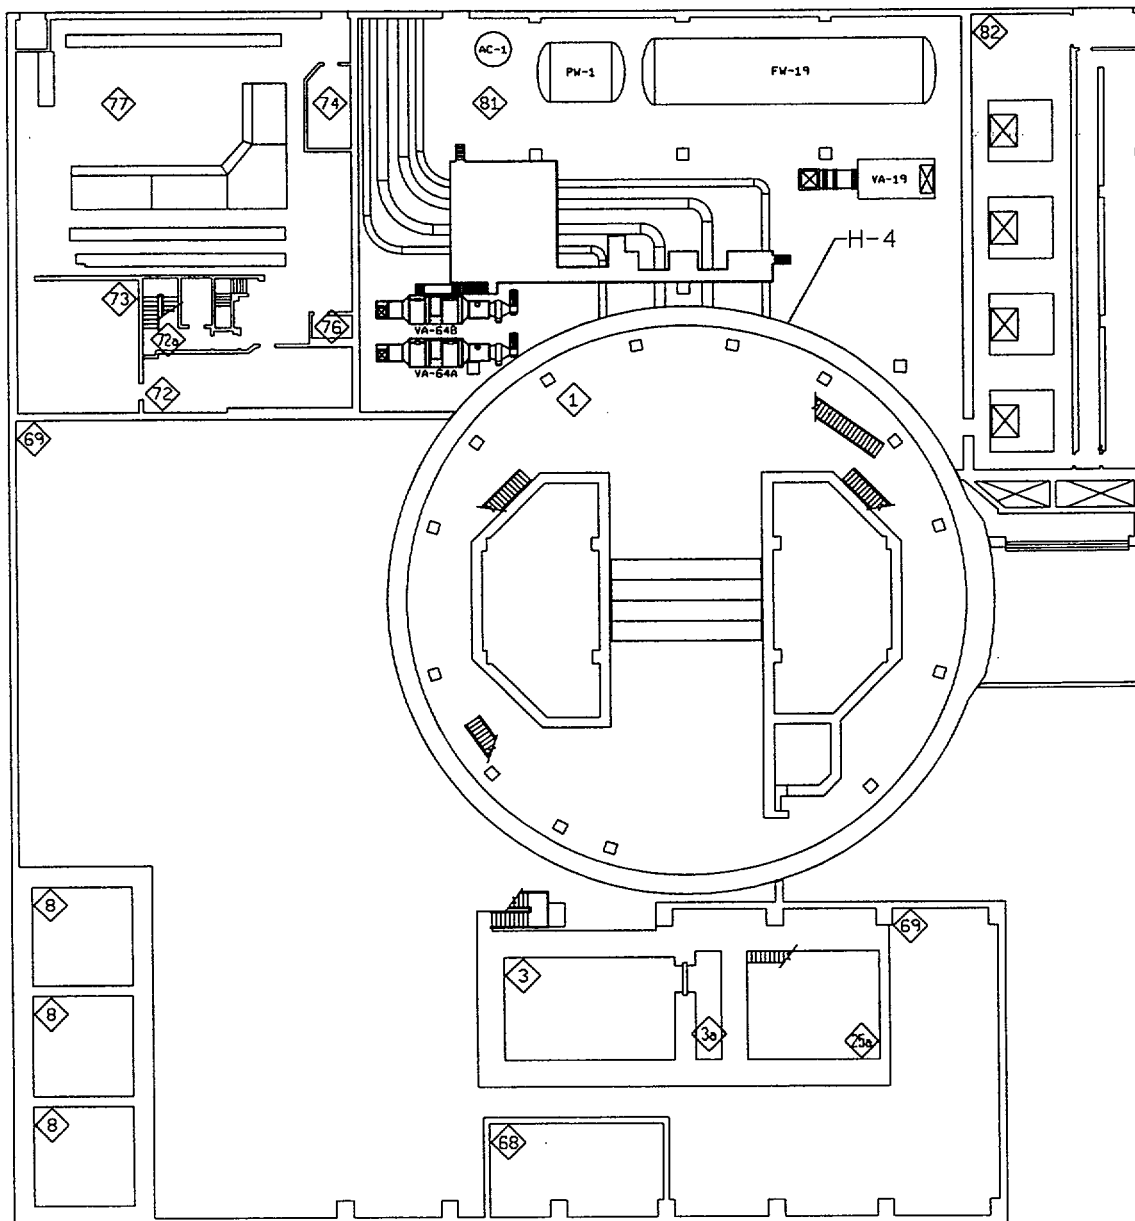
Auxiliary Building - Plant Elevation 1007'-0" & 1013'-0
